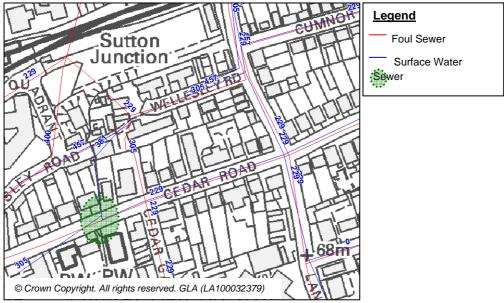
Thames Water Network Plan, Cedar Road, Sutton Junction
